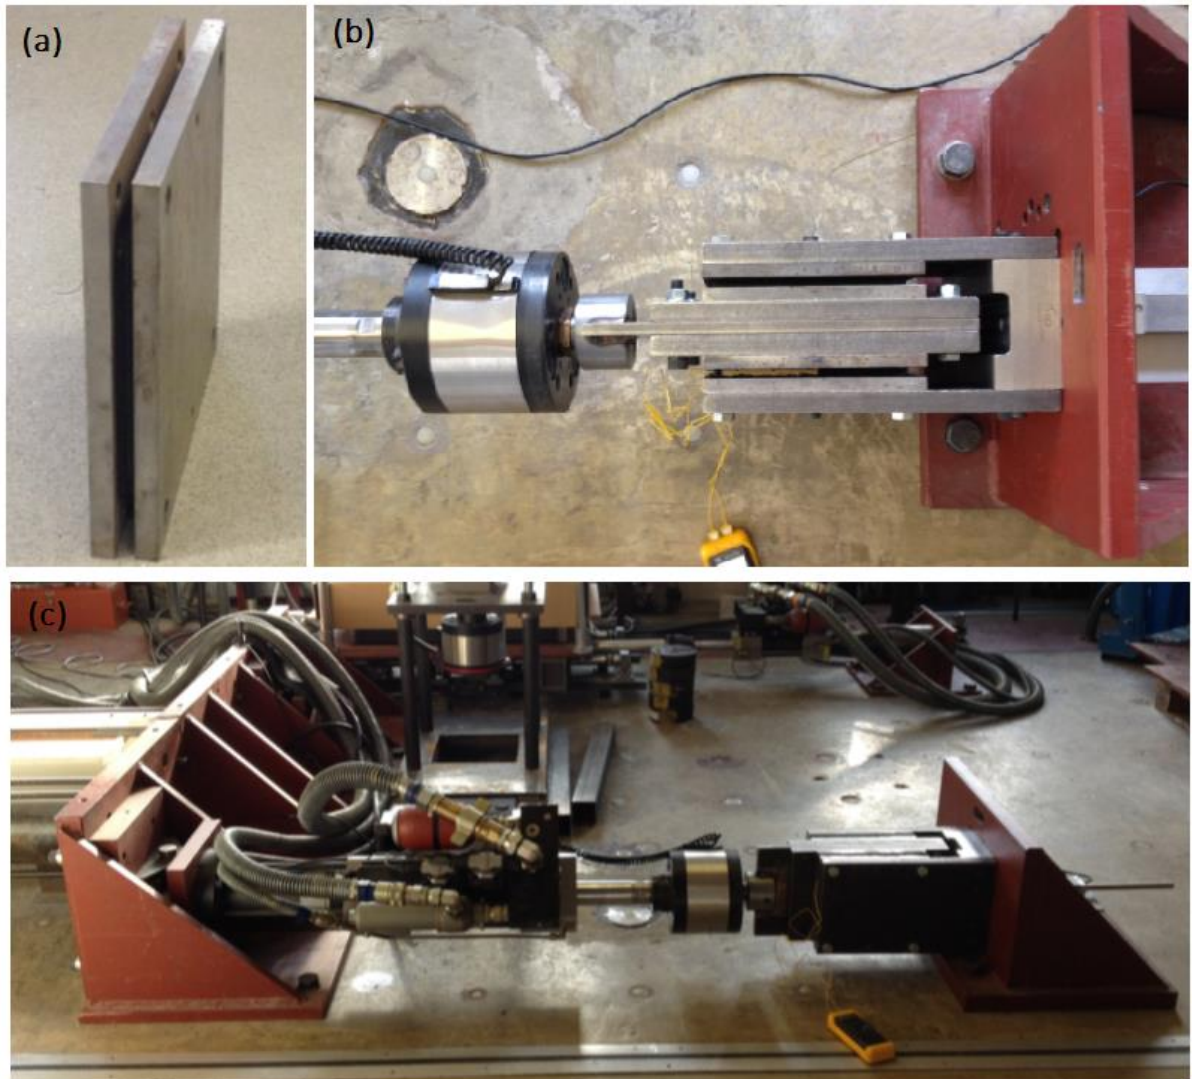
VE damper testing setup: (a) single VE damper, (b) built-up VE damper installed in rig, and (c) full test rig
